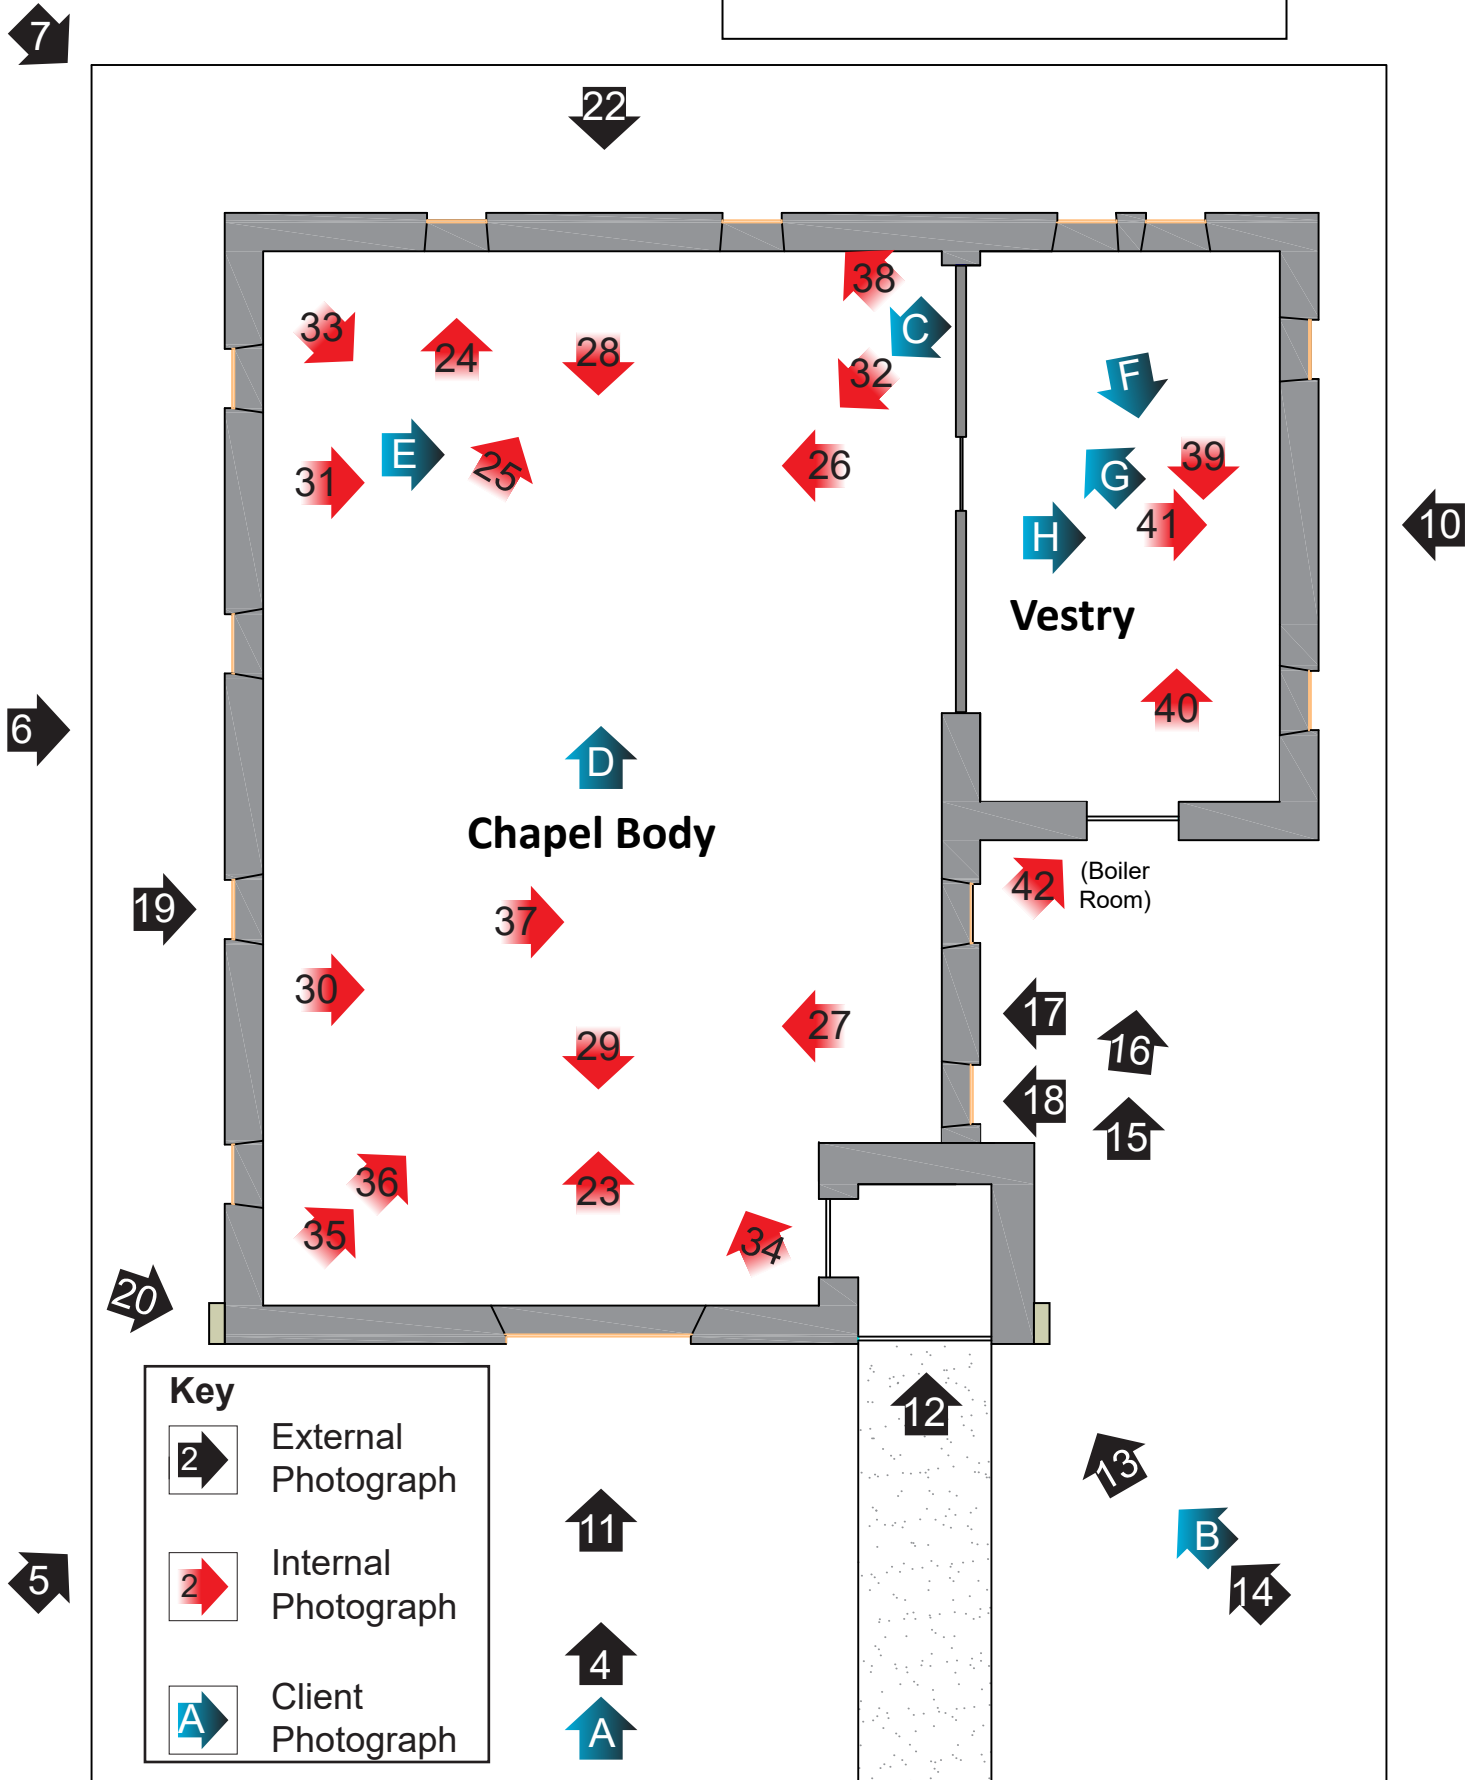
Plan of Bethesda Chapel and location of archaeological plates (external, internal & client) on Back Chapel Street, Llanrhaeadr ym Mochnant, Powys, SY10 0 JY. Scale 1:200 @ A4.
